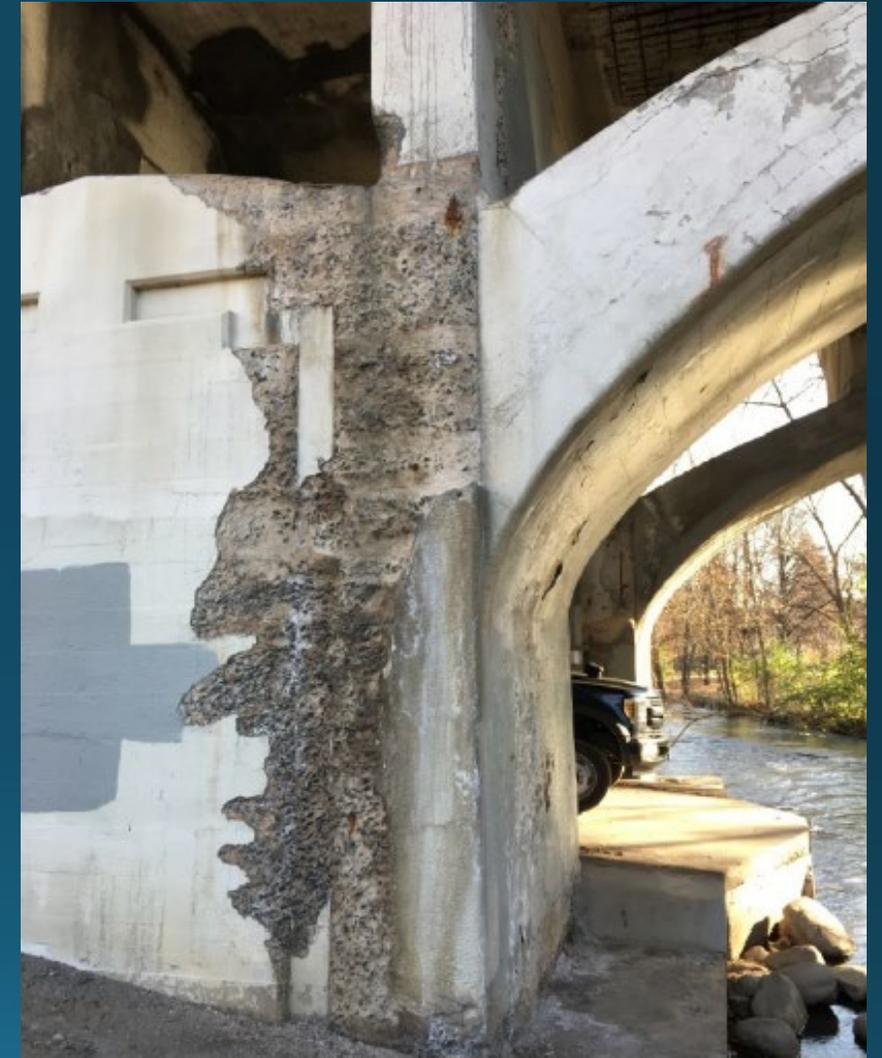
Concrete Spalls and Cracks on all Elements
